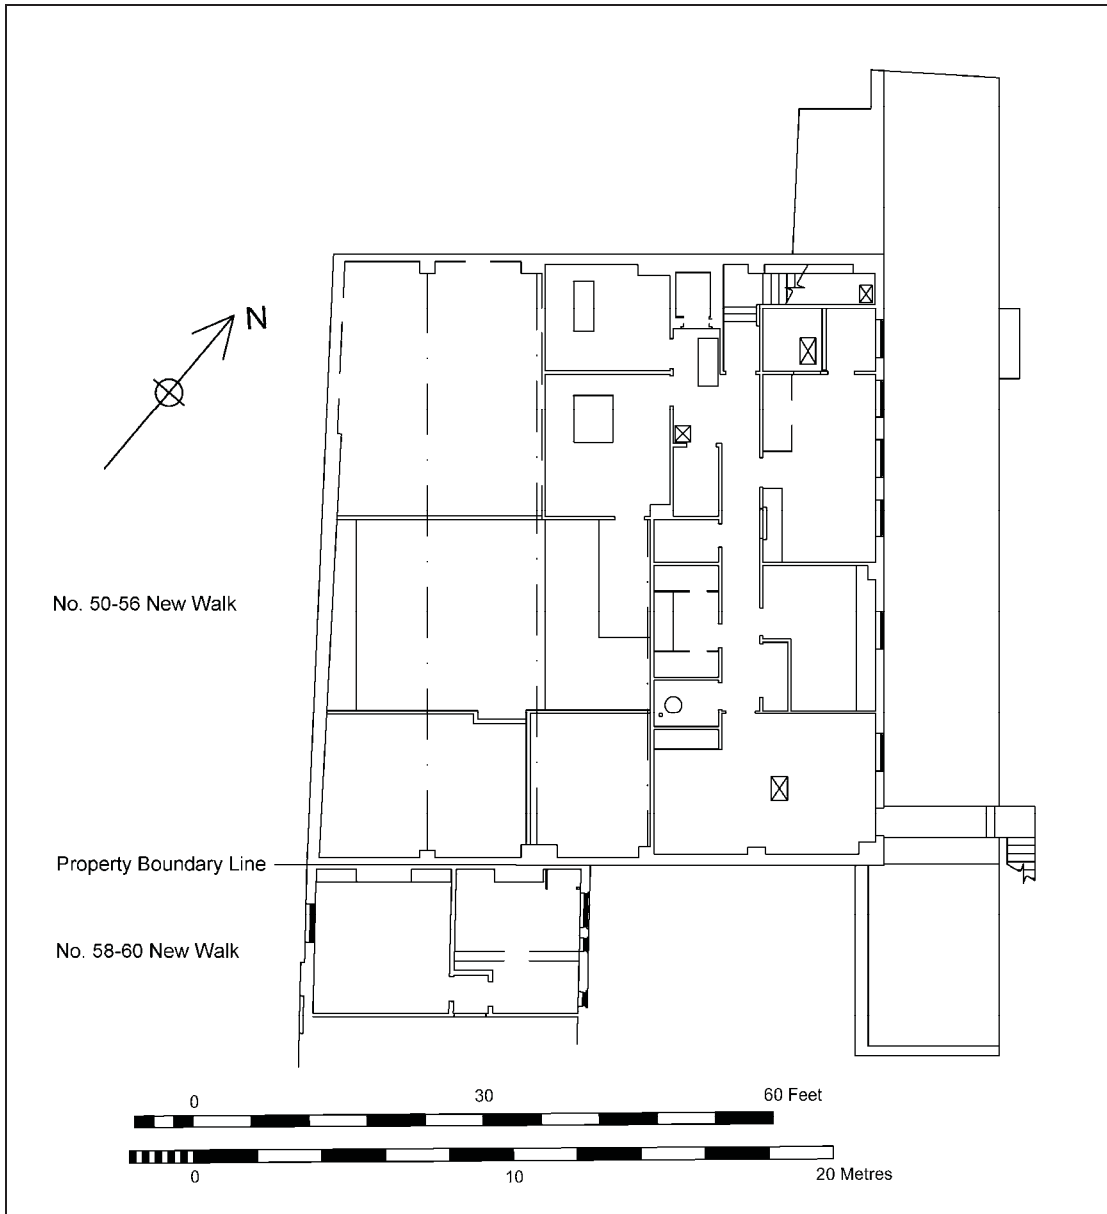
Existing first floor plan of 50-56 New Walk (taken from survey drawings supplied by Greenhatch)
